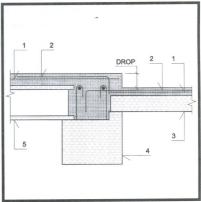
Hollow Core Slab / Beam/ Plank Connections With Drop
